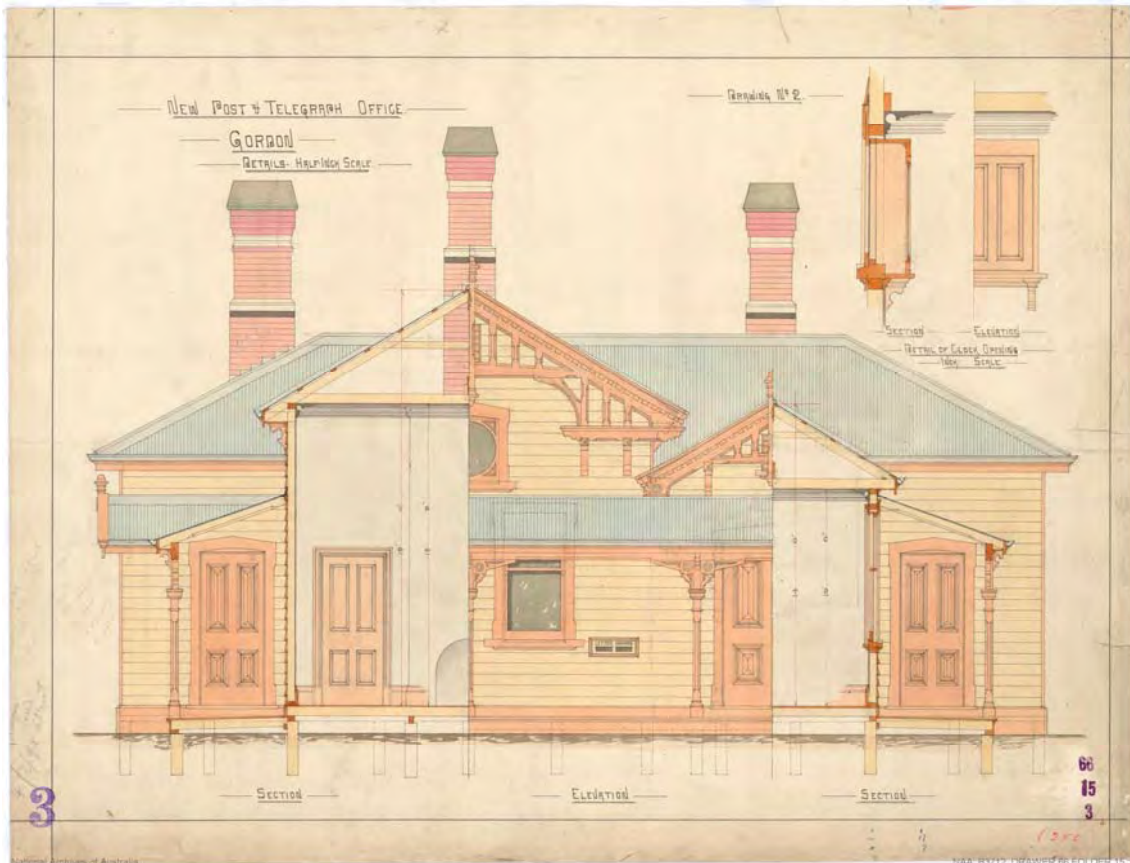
Victorian Public Works Department, Proposed Gordon Post & Telegraph Office, Section, Elevation & Detail drawings, 23 May 1890. Source: National Archives of Australia, Series B3713, drawer 66 folder 15.
